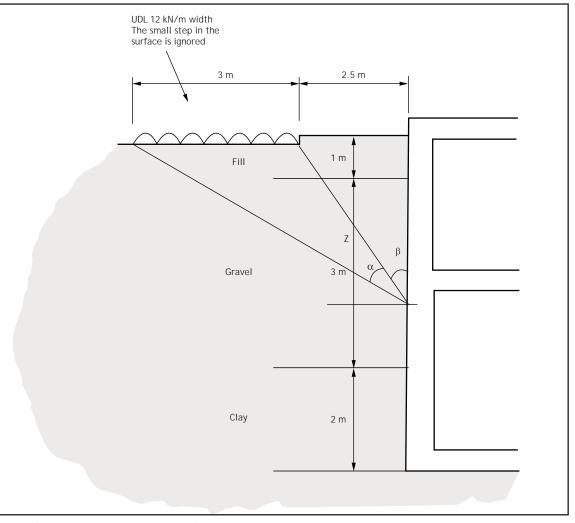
Parameters for calculation of pressure due to strip load parallel to wall.
